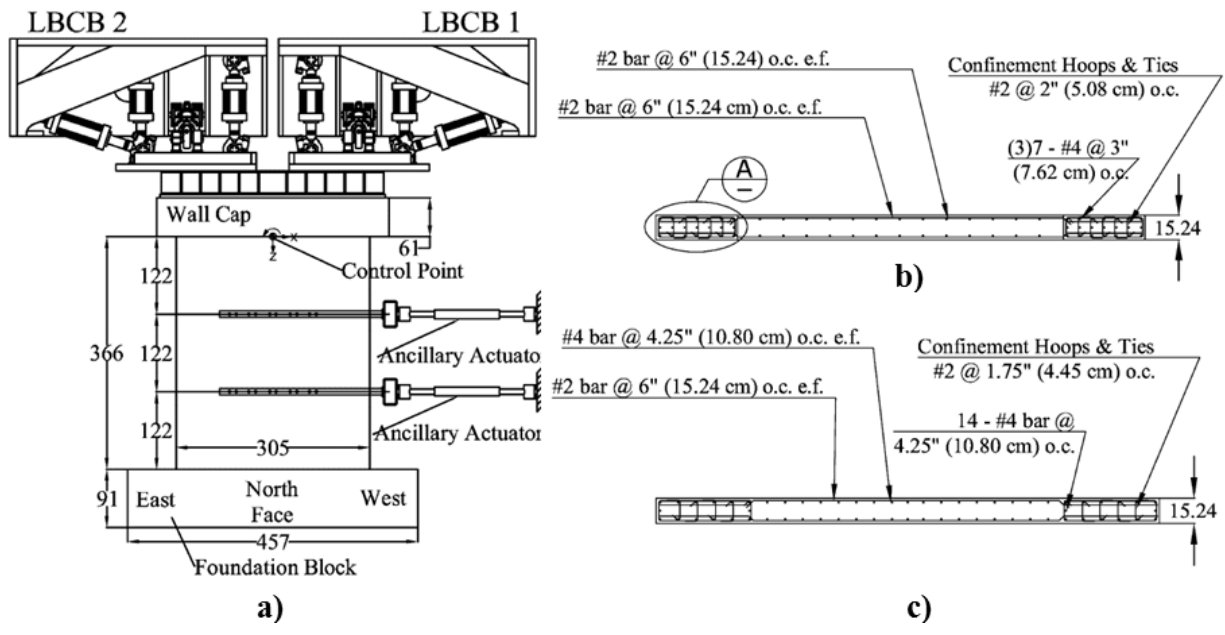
UW/UIUC planar walls – a) Test setup and overall geometry; b) Cross-section for specimens PW1, PW2 & PW4; and c) Cross-section for specimen PW3
